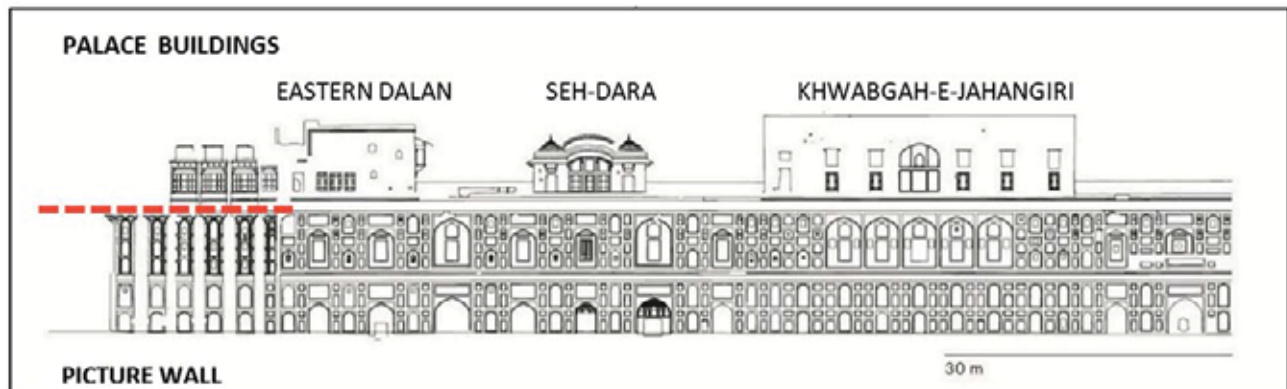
Elevation of the oldest part of the picture wall showing palace buildings on top and rows of pigeon houses on the walls below.
